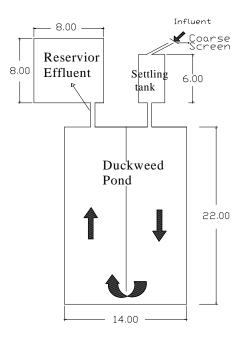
General Layout of Al-Aroub Wastewater Treatment Plant
